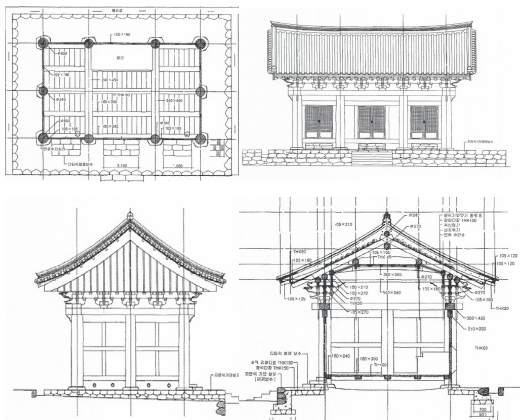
Jeongsusa Daeungjeon (Plane, Elevation, Side, Longitudinal section)
